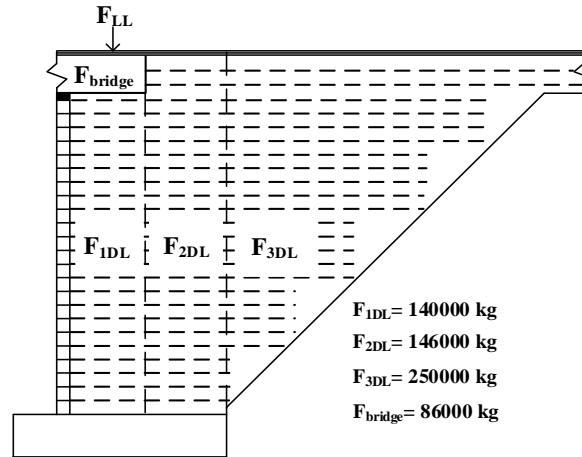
Abutment dead load by section and bridge dead load split equally over both of the abutments
